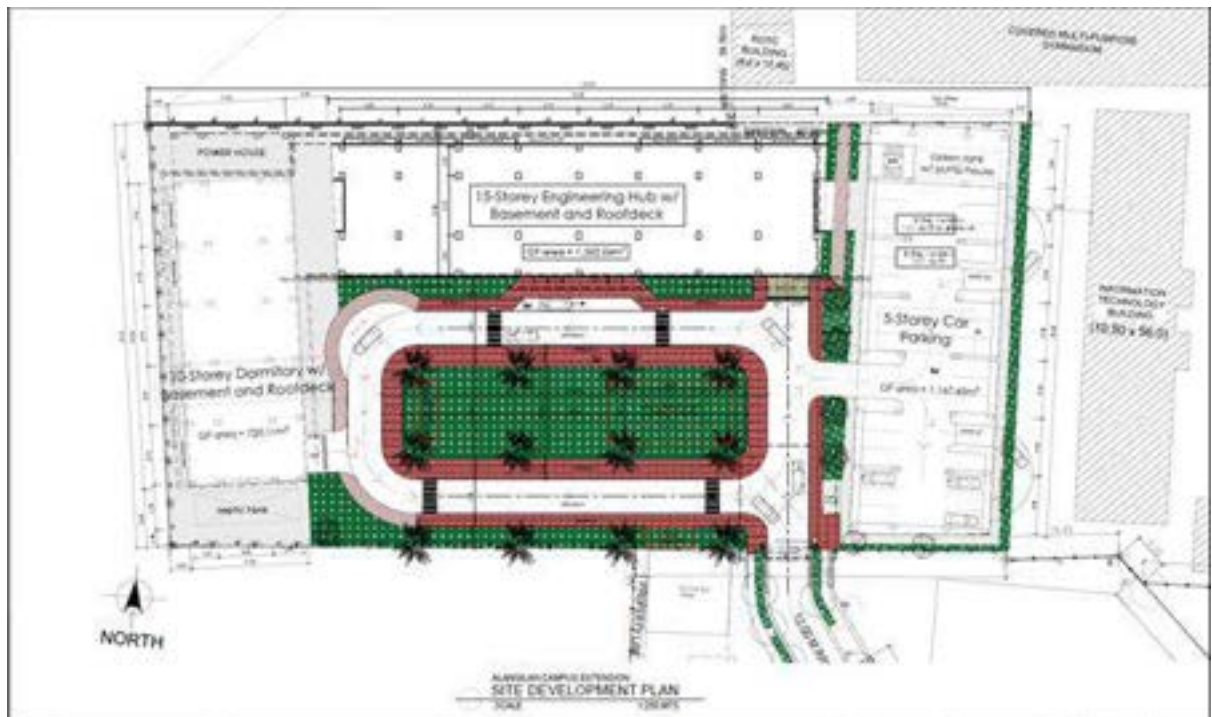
Site Development Plan of BatStateU Alangilan Campus Extension
